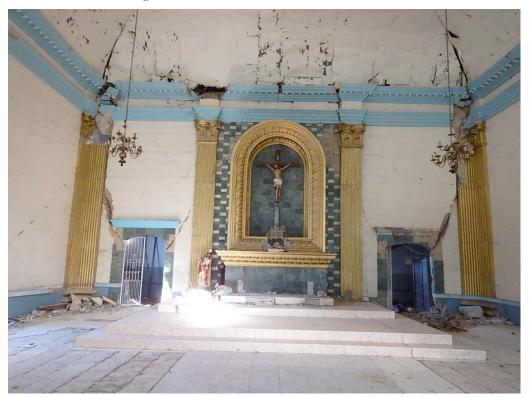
View of the altar wall, with diagonal cracks passing through the door openings.
